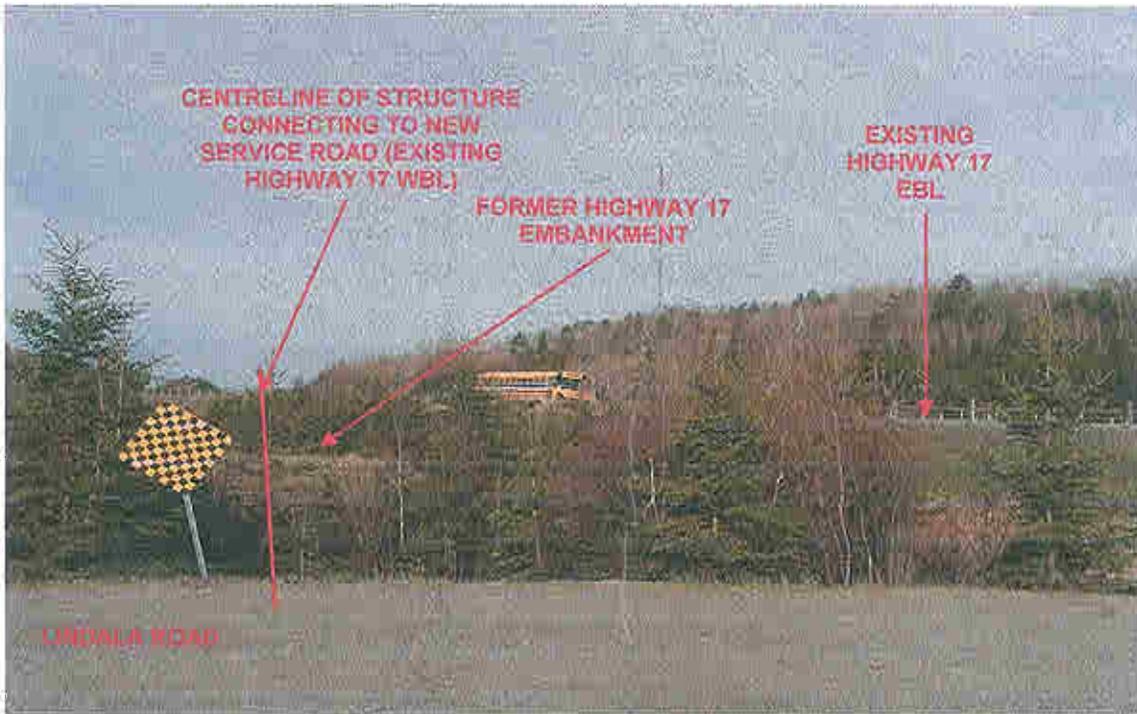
VIEW: Looking northerly from south shoulder of Highway 17 EBL (Sta. 17+550 Alt. 4). Embankment and structure alignment (East Option) are applicable to Alternatives 4 to 9. North abutment located north of WBL for Alternatives 6 to 9. Note alignment through swamp north of WBL. Depth to firm bottom 12 to 15 m. Depth to bedrock 20 to 24 m. (May 1, 2006).
